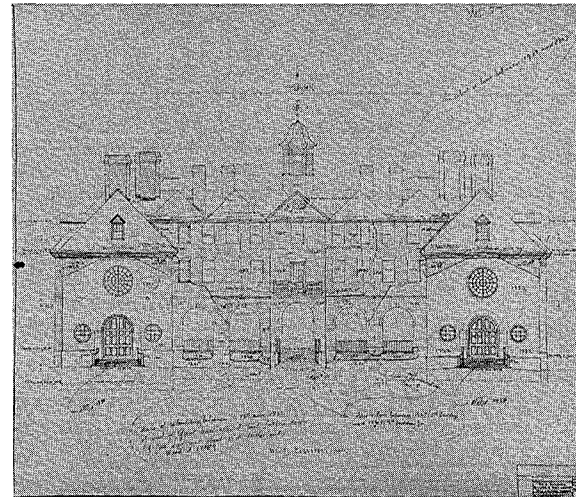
Perry, Shaw, and Hepburn, *West Elevation, Showing Dates of Brickwork, The College of William and Mary*, drawing, 1929–1931, Colonial Williamsburg Foundation.
